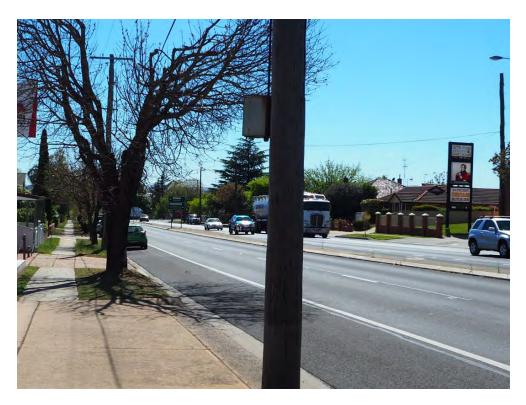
Looking left (generally north-east) along Stewart Street near the existing access driveway that will be removed and replaced by a new exit-only driveway from the proposed drive-through take-away food outlet and showing the existing traffic environment.
